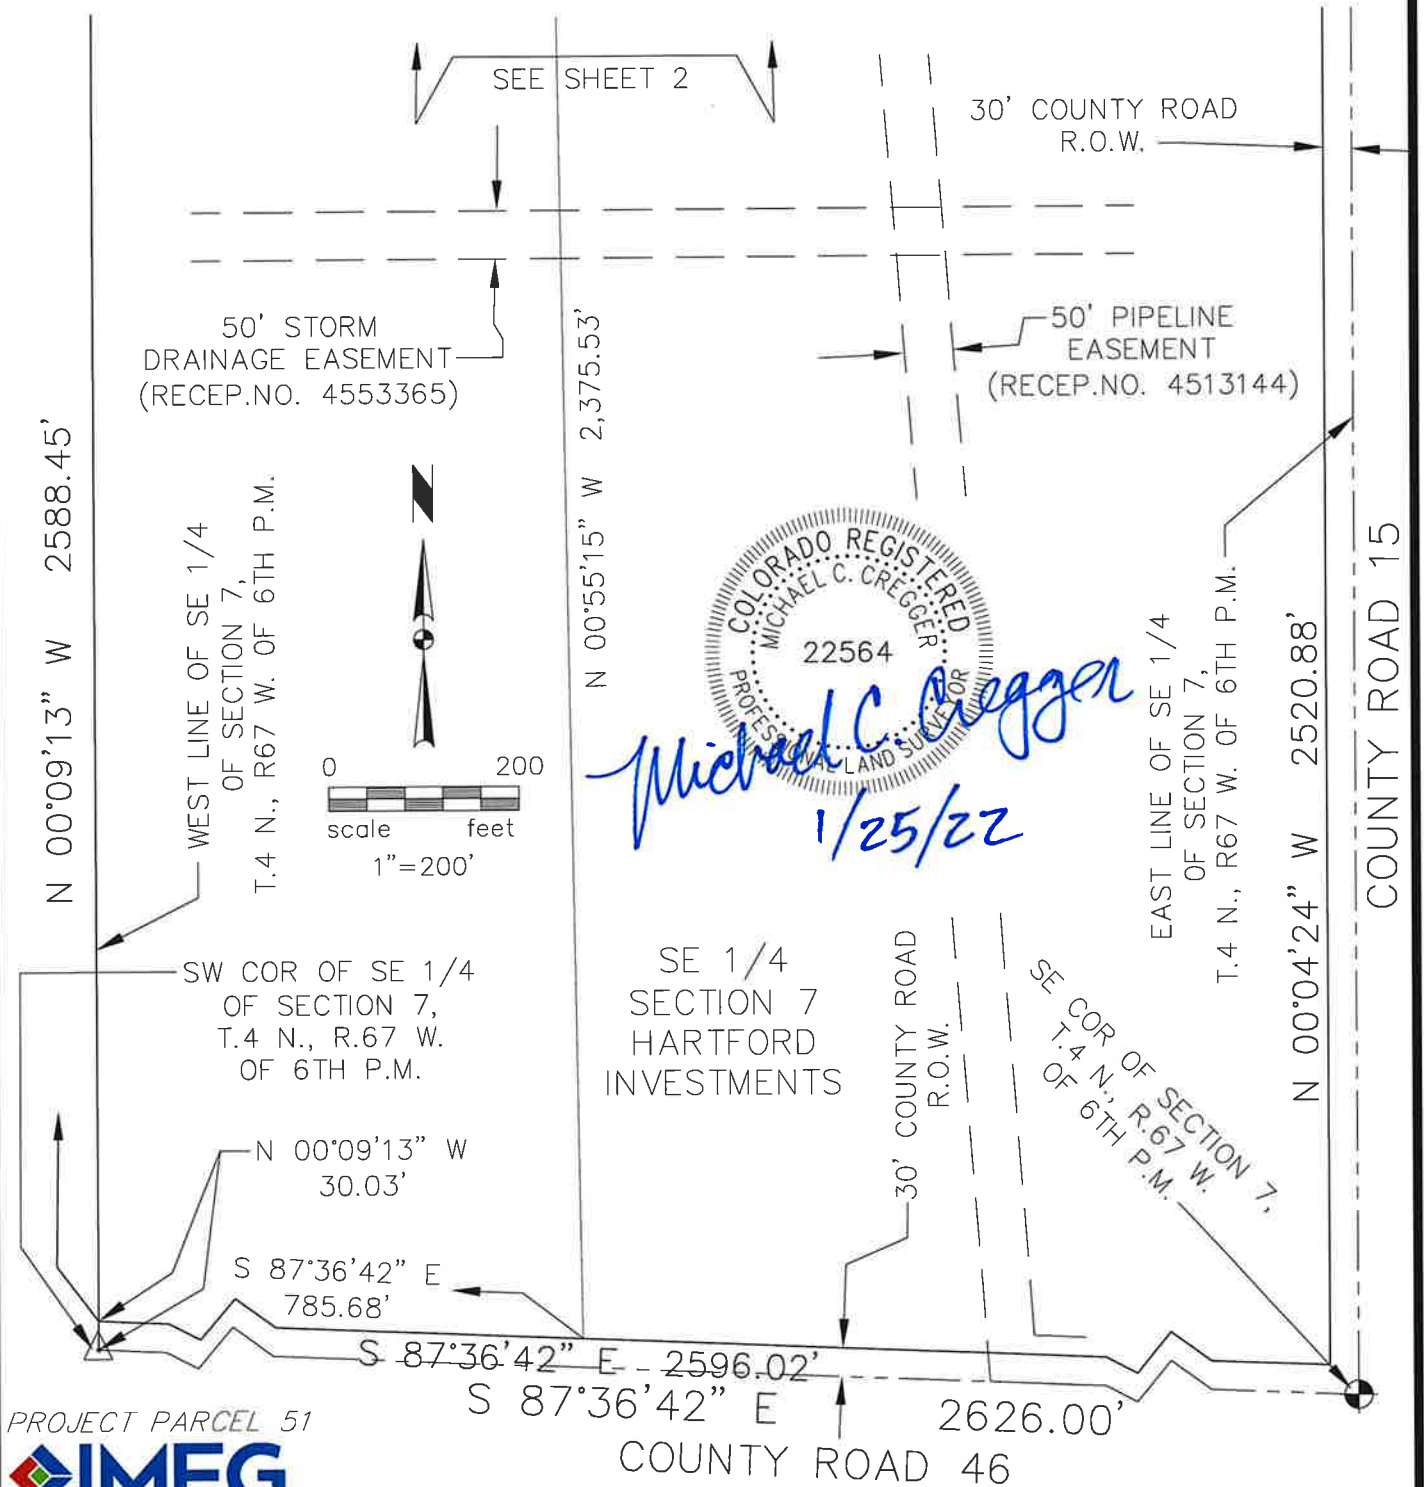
EXHIBIT TEMPORARY CONSTRUCTION EASEMENT LOCATED IN SE 1/4 OF SECTION 7, T.4 N., R.67 W. OF 6TH P.M., WELD COUNTY, COLORADO
